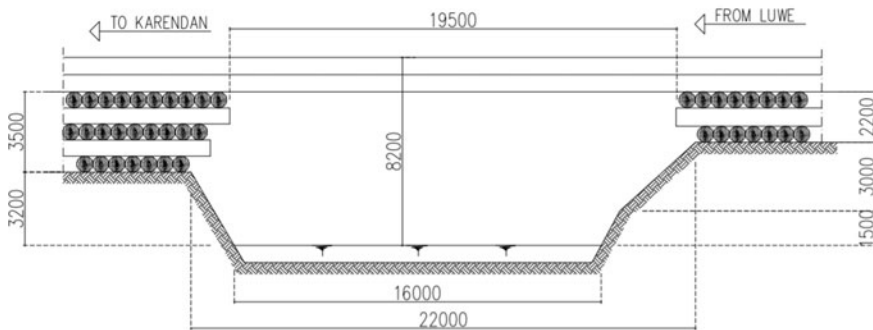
Documentation and structural sketch of Palili bridge before redesign (2014)
